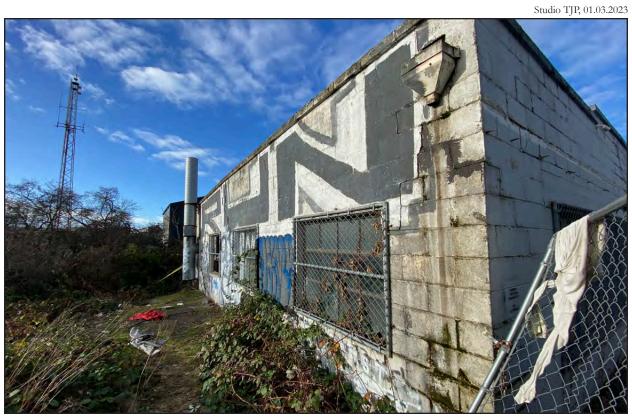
$\bullet\,$  1265 S King Street, viewing northwest at the southern façade
